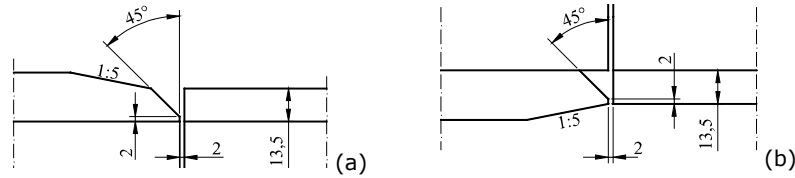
Preparation details for full penetration welds between external diaphragm and top flange (a), and bottom flange (b)
